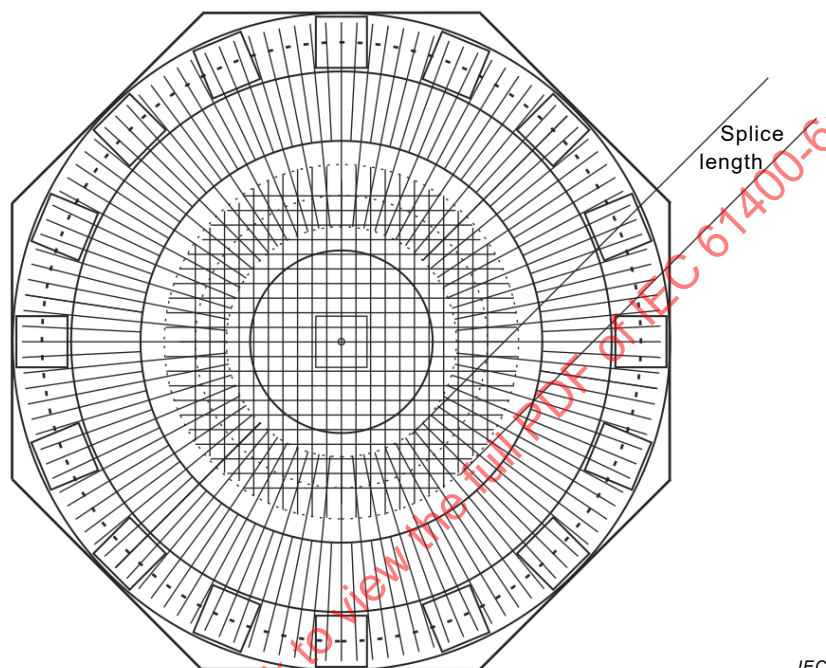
Top tie reinforcement in a rock-anchor foundation
